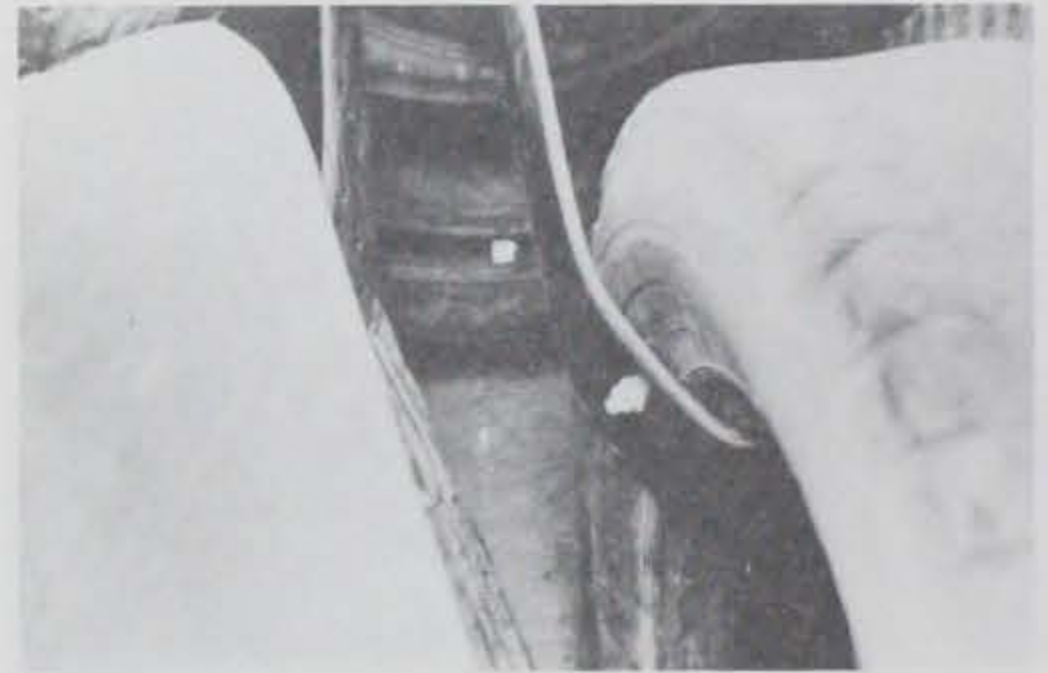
Closeup showing bolt which fastened the belting to the tires (all such bolts broke, with no adverse consequences).
